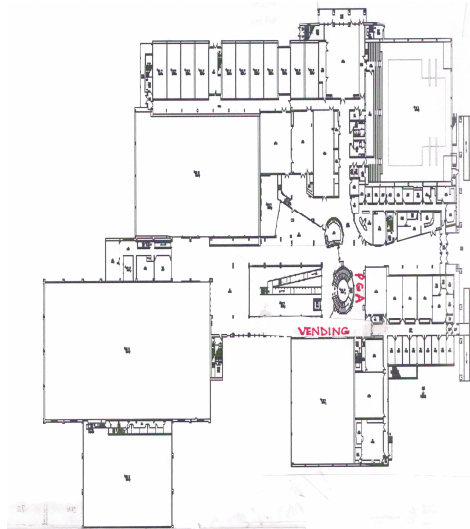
Mixed-Use Building Floor Plan, 1st floor; vending machines noted; red “A”=aluminum receptacle, red “P”=plastic receptacle, red “G”=glass receptacle.
